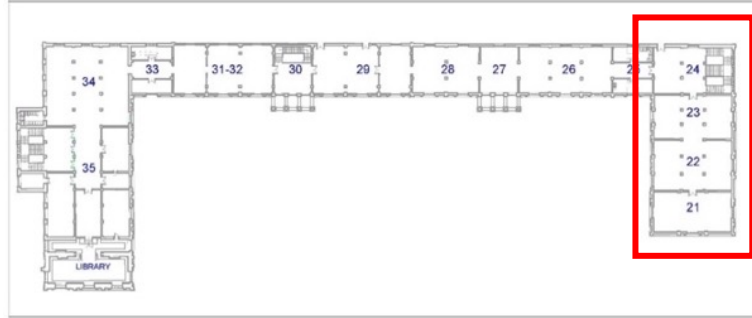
The key plan for first floor plan shows the “Section 1” which composed of Halls number 21, 22, 23, and 24
